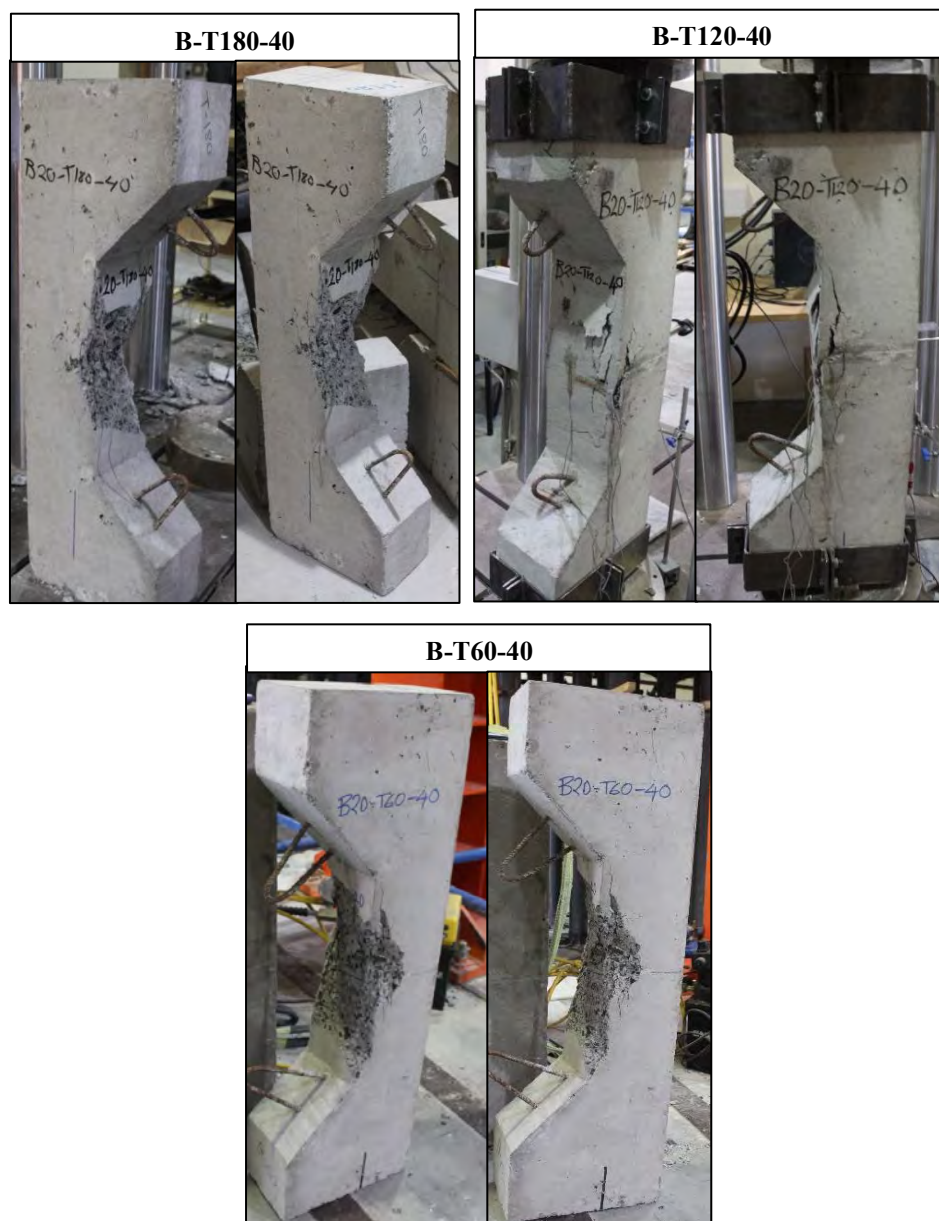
Photos of Group 2 column specimens tested under 40 mm eccentricity, after failure
